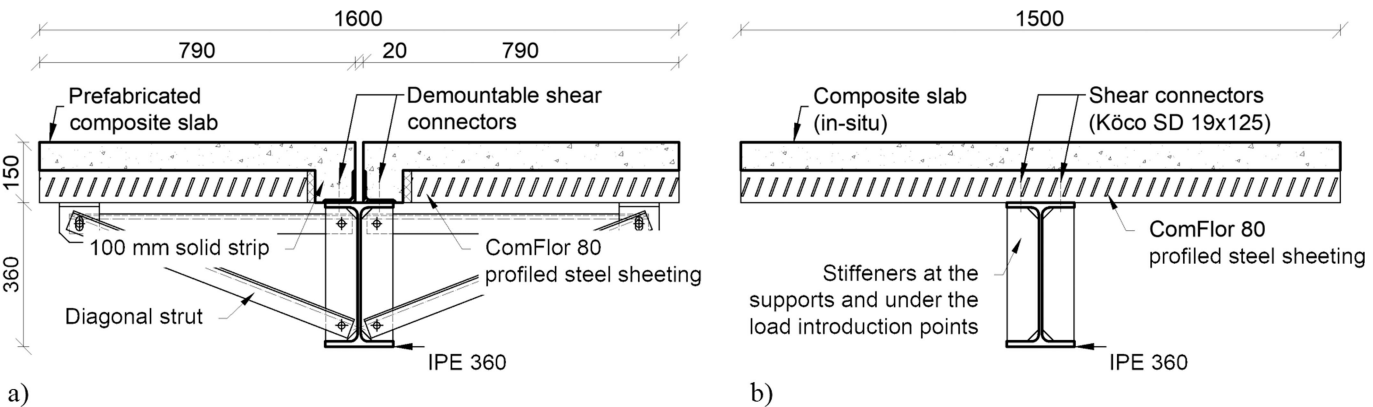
Cross sections of the tested beams: a) REDUCE (B7 and B8); b) DISCCO (2-10)
